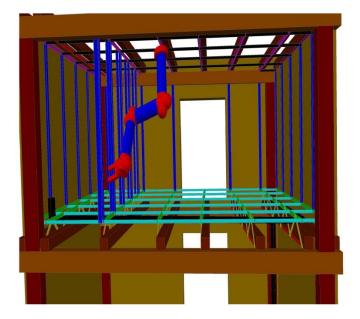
Building renovation using the proposed system. The proposed substructure has different purposes. First it can be used to reinforce the existing structure when needed. Then, it will be used as a support for distribution and services. Finally, the robotic appliances will run along that substructure.
